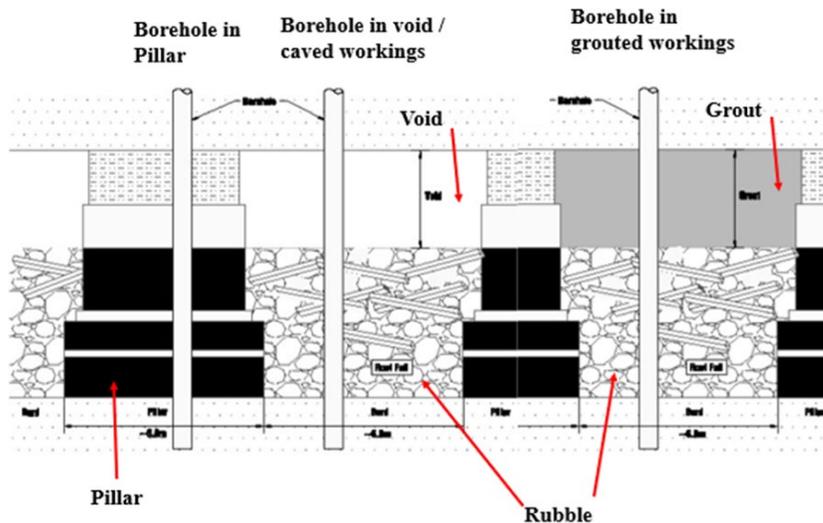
Typical mine level conditions encountered in drilling (Knott et al, 2016)
